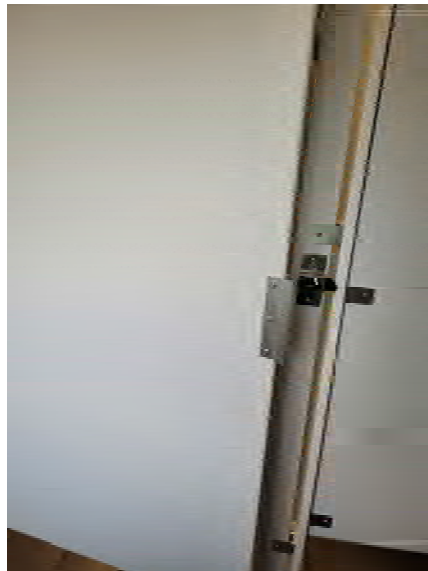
Jamestown Civic Center Toilet Room Door Hardware
